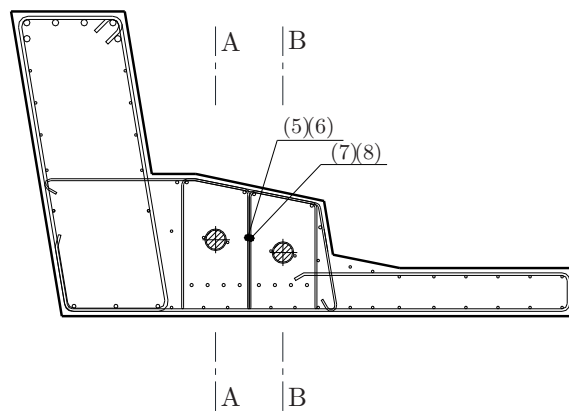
Strain gauges on the anchorage blister reinforcement (Section D-D)
